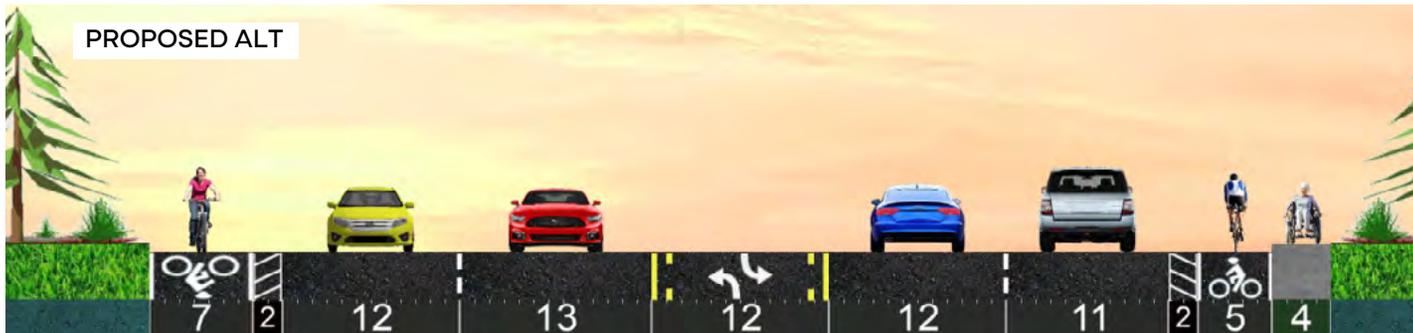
Concept: LOVR between South Bay Boulevard and Palomino Drive (Alternative 1)
